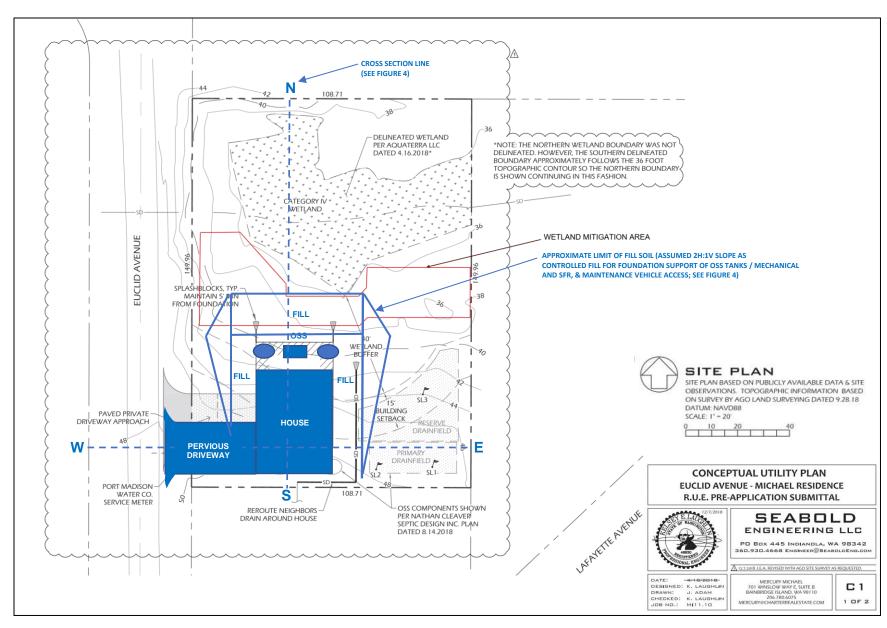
SITE DEVELOPMENT LAYOUT AS RECOMMENDED IN NOCA
